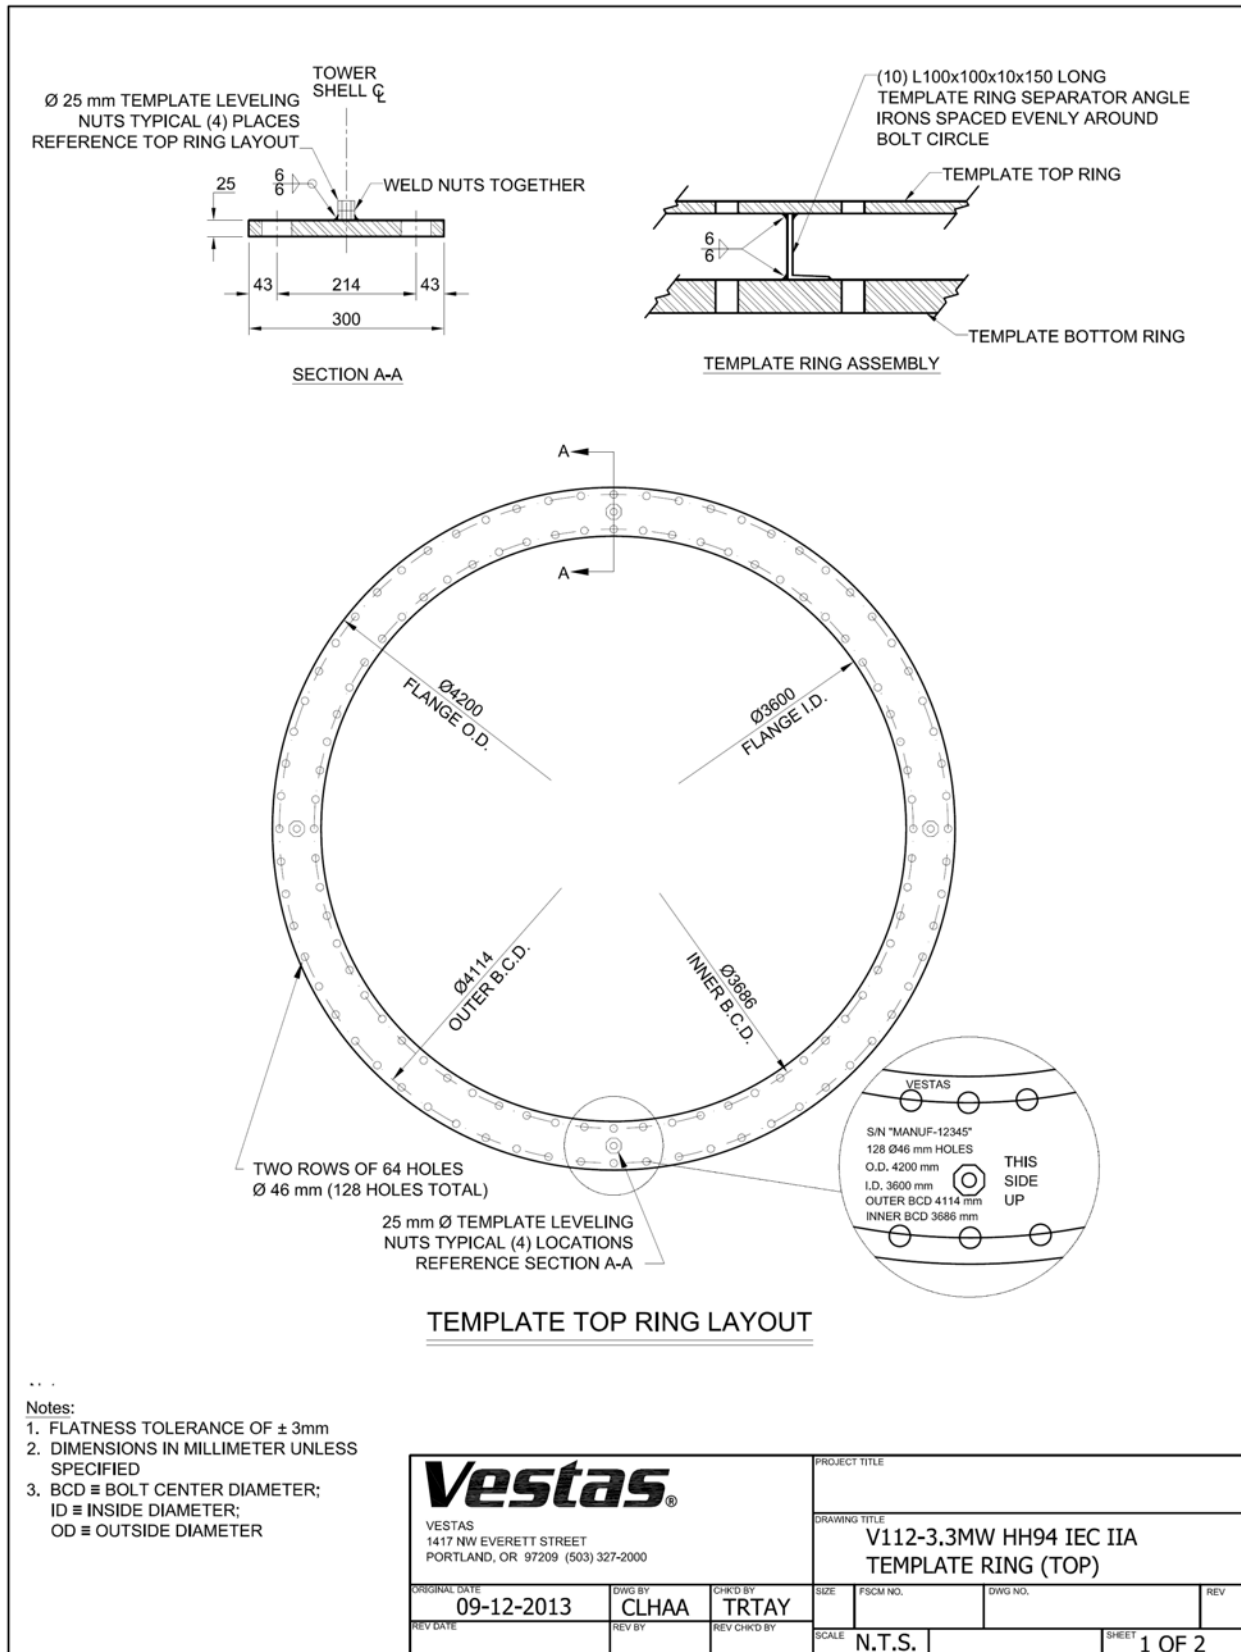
Tower Foundation Bolt Template Ring (Cont.)
